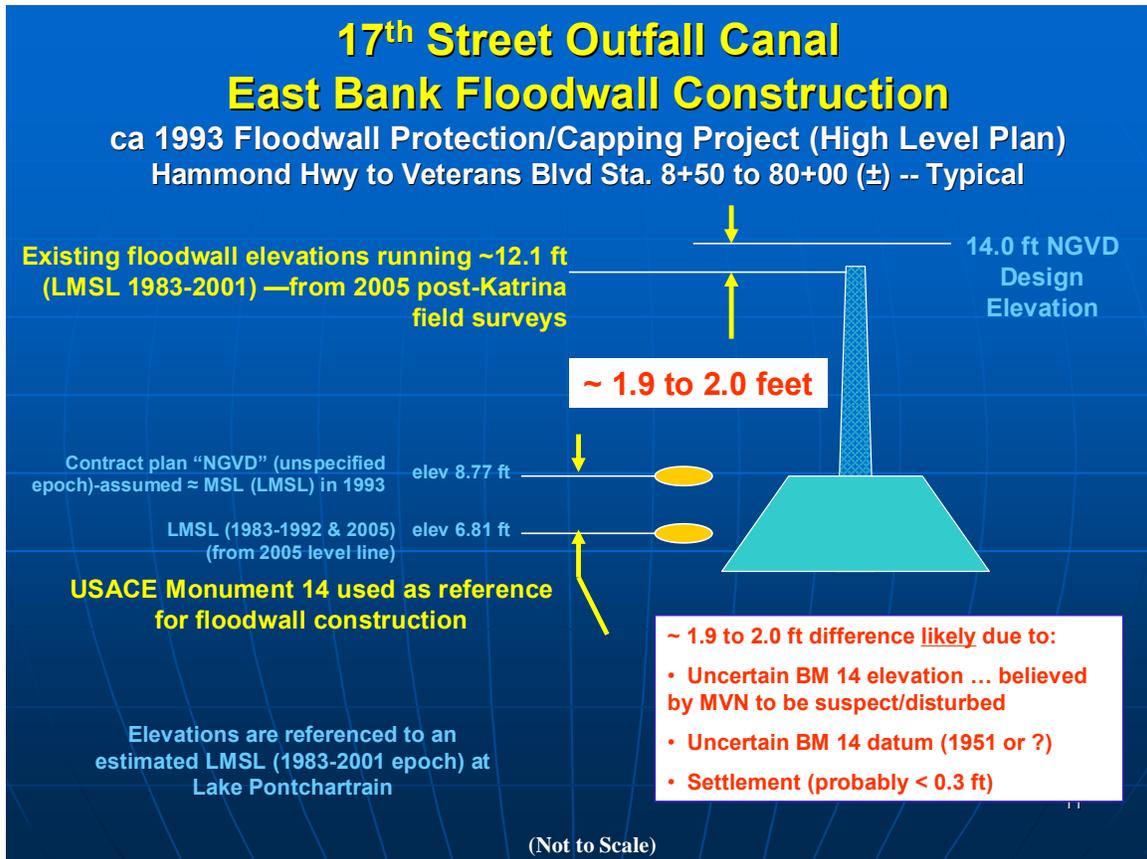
Design versus current floodwall elevation—East Bank 17th St. Outfall Canal.
